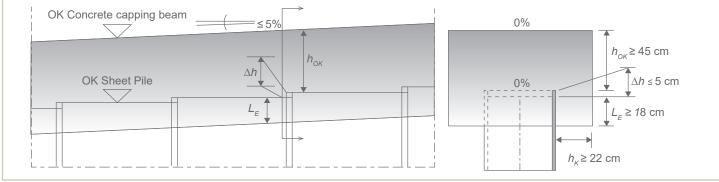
Capping beam with sloped surface restricted to the 'fixed connection' design method.
